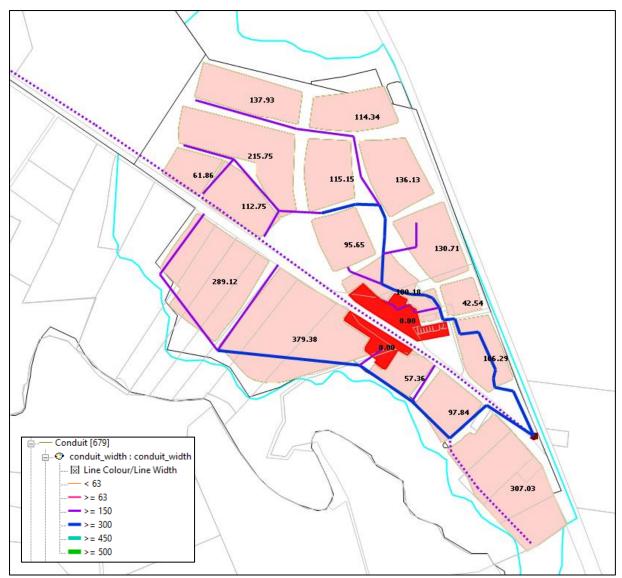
Indicative Clarkefield sewer servicing arrangement
